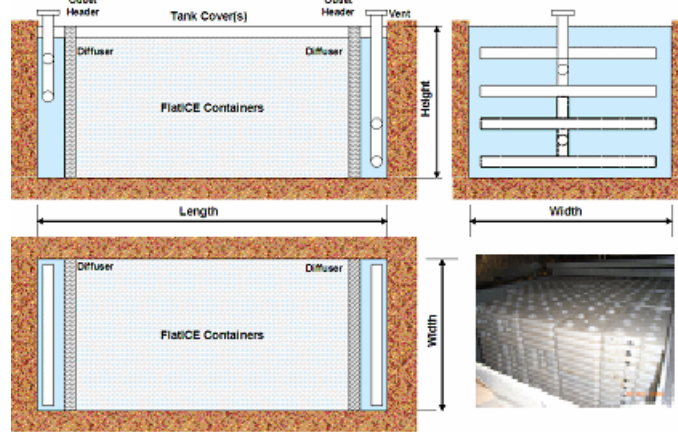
Typical Concrete FlatICE plastic containers TES Tank Design
